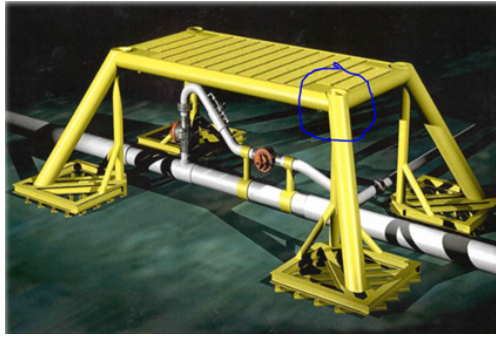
Typical corner of a protection structure (Picture provided by Per Nystrøm)
